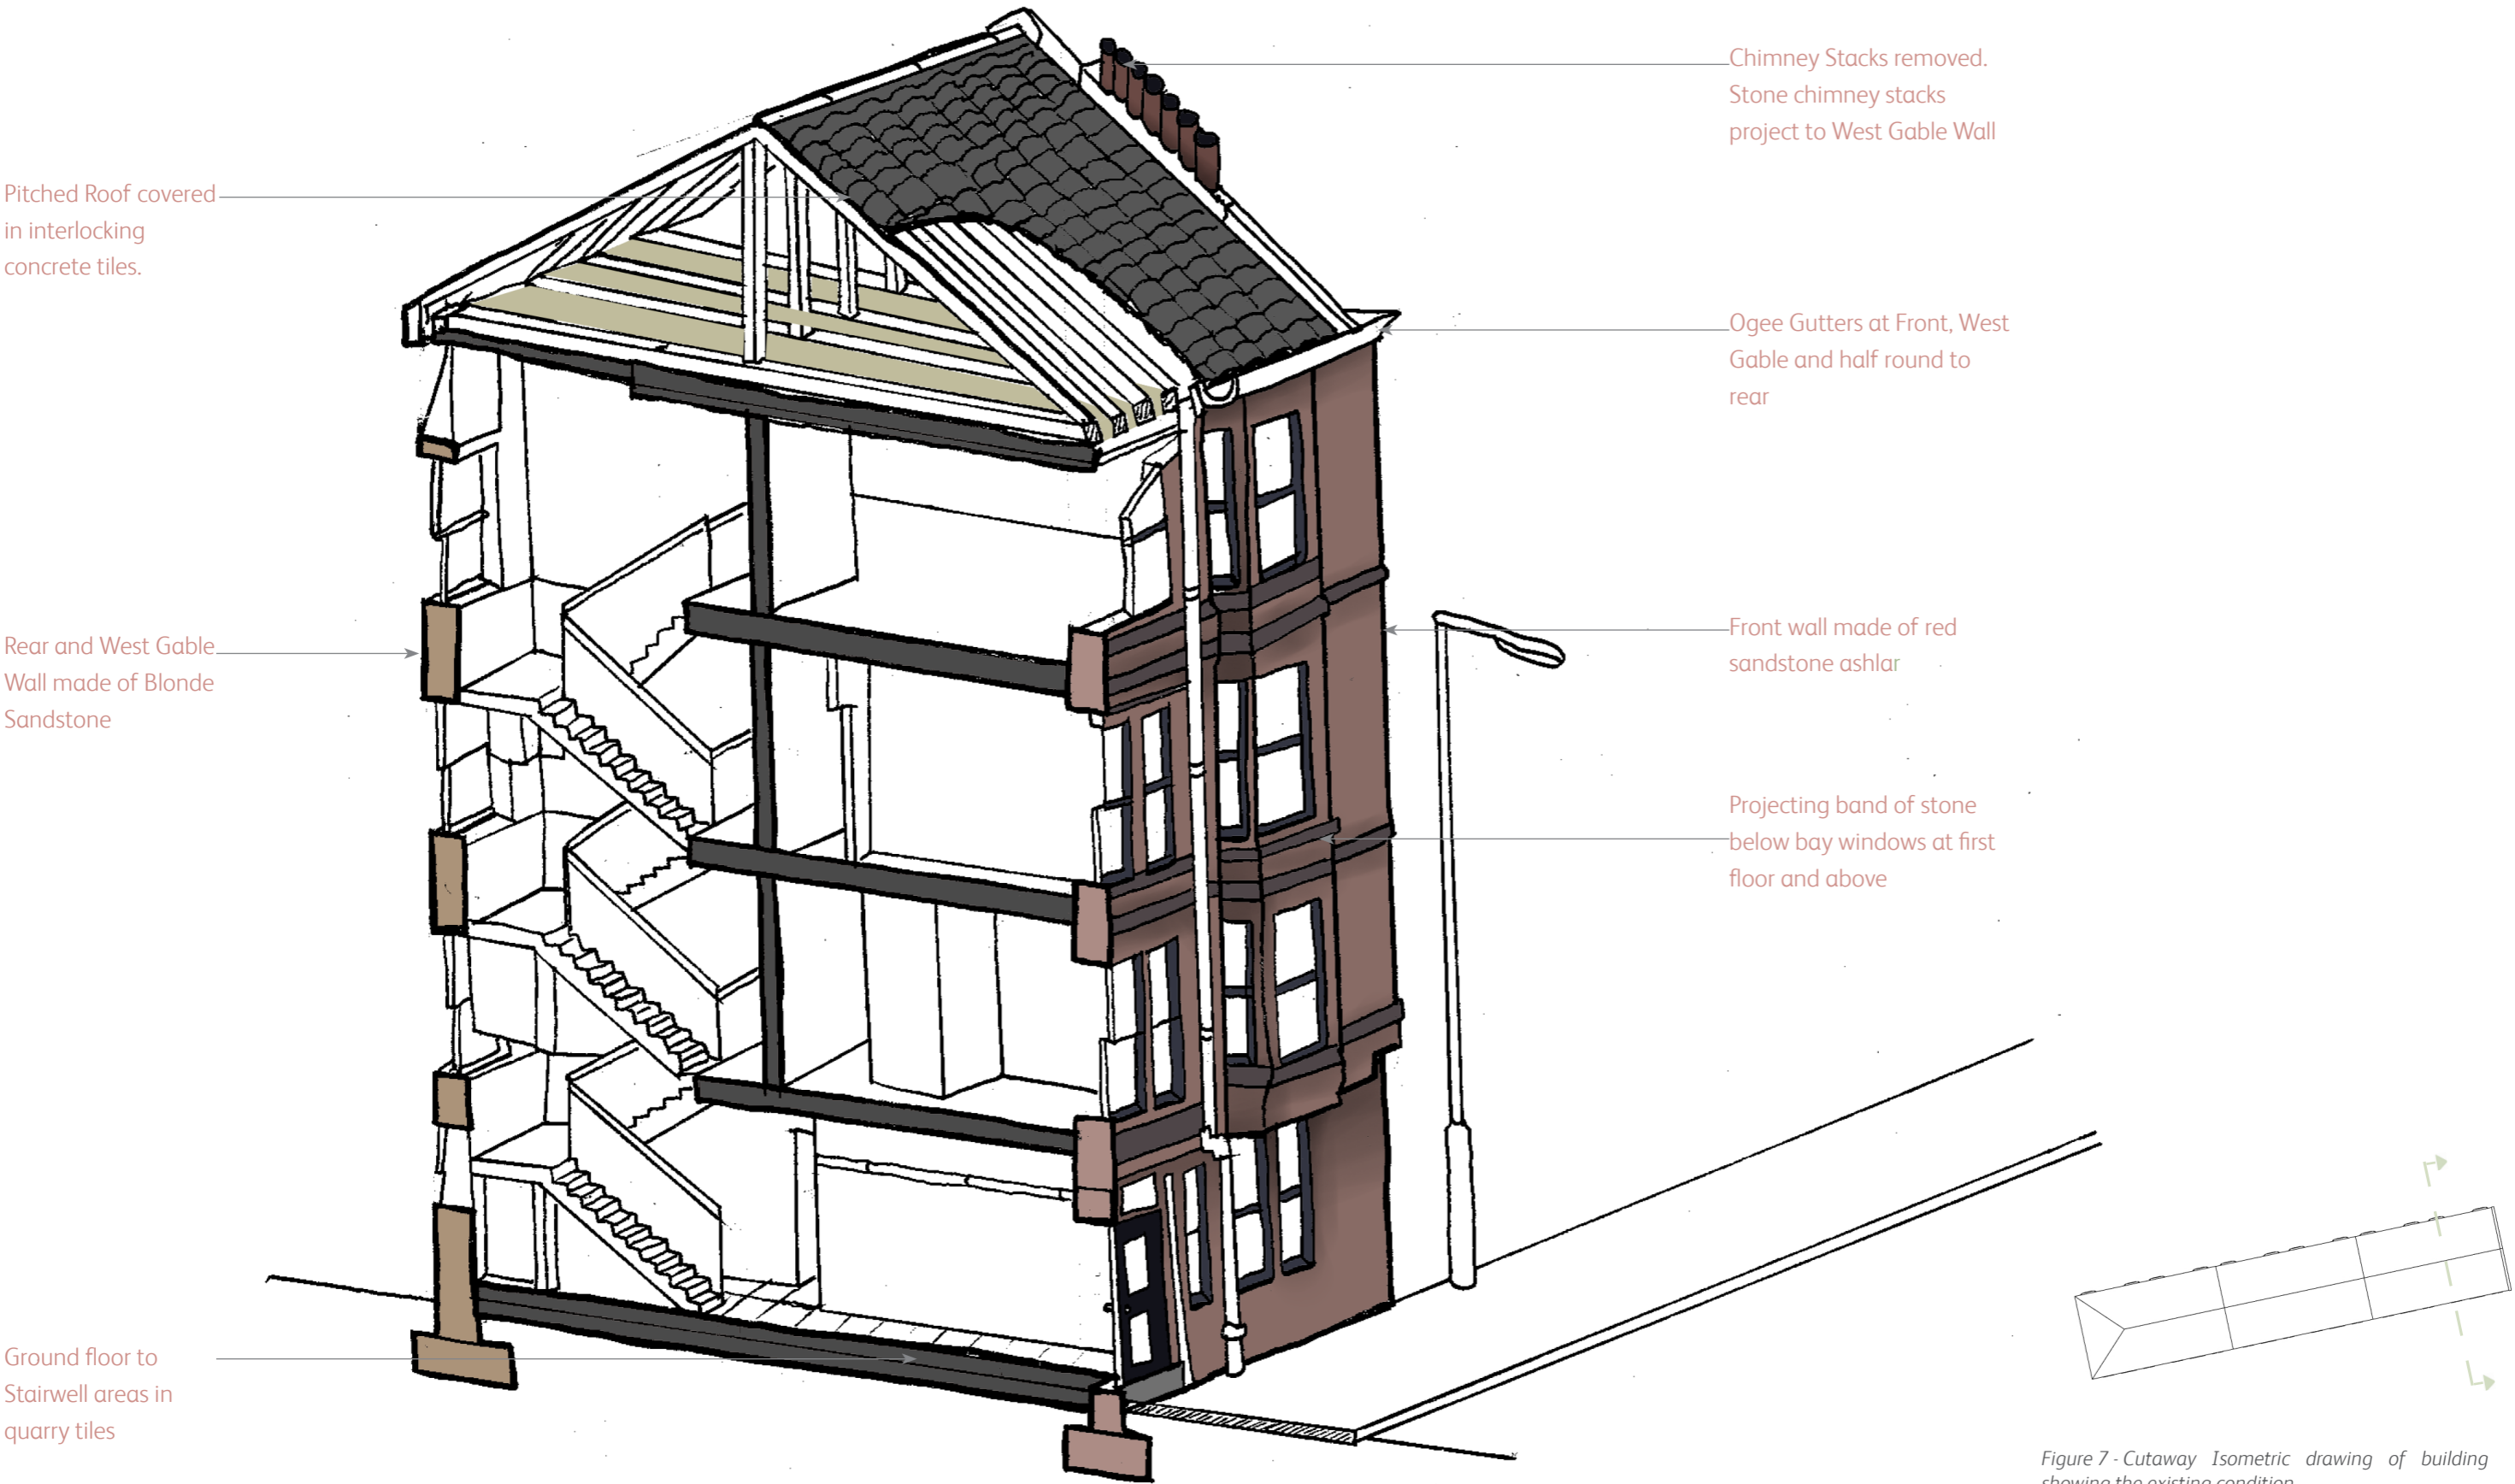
Cutaway Isometric drawing of building showing the existing condition
